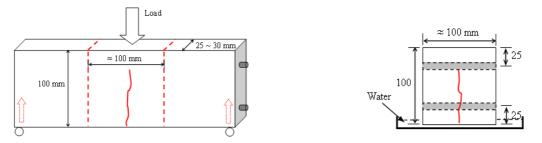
Formation of a centre crack under three point bending (left) and detached specimen with a crack in contact with water for observation of capillary suction (right)
